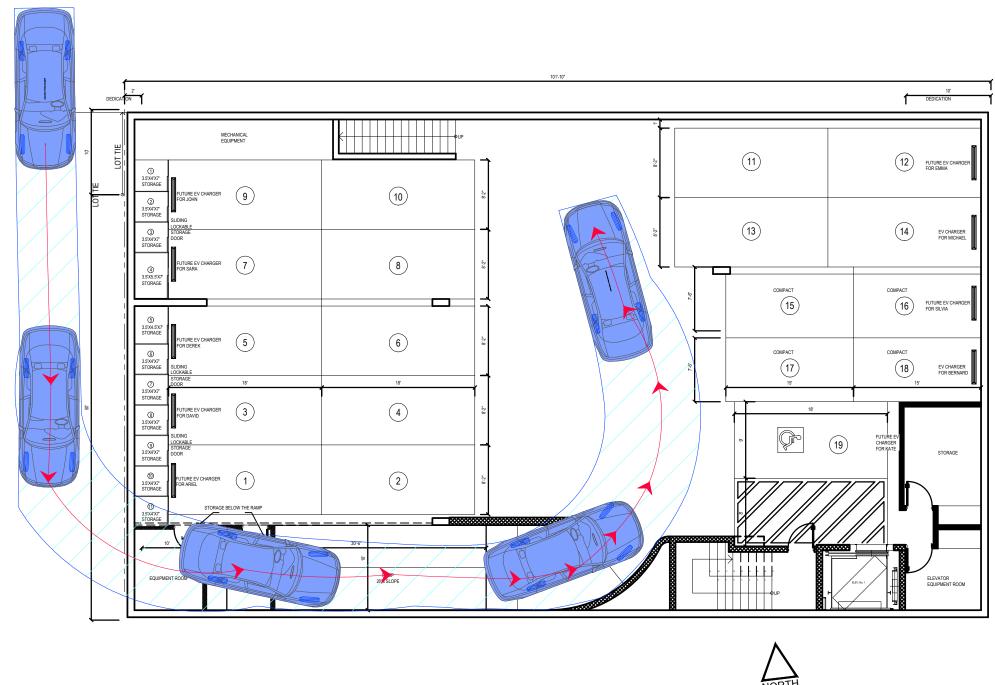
FIRST FLOOR RAMP ENTRY ACCESS SWEPT PATH
